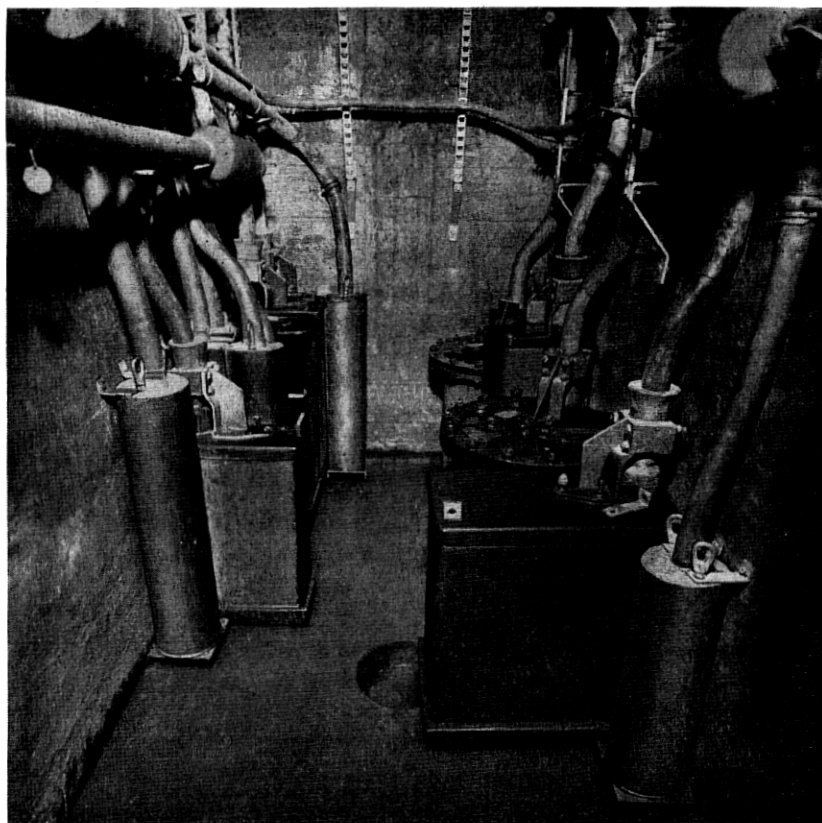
Exchange area loading installation in side street auxiliary loading vault. In congested areas, space limitations frequently require the installation of underground cable loading coils in an auxiliary loading vault located in a side street near its intersection with the street under which the main cable conduit system is laid. Extensions of the case stub cables carry the coil terminal leads to the main cable splices. At time of photograph, a total of 18 cases containing a total of 7283 coils were installed in this auxiliary vault. Six cases had 303 or 304 coils, and 12 cases had 455 or 456 coils. The 18 cases include 2 cast iron cases, 5 rectangular welded steel cases, and 11 tubular, thin steel cases. The individual coil codes are Nos. 612, 632 and 643; 92% have 88 mh inductance, the remainder being 135 mh coils. 27% have permalloy cores; the remaining 73% have molybdenum-permalloy cores and formex insulated windings. This figure shows the far end of the loading vault where 14 cases are placed. Several tubular steel cases are hidden by larger cases in foreground.
